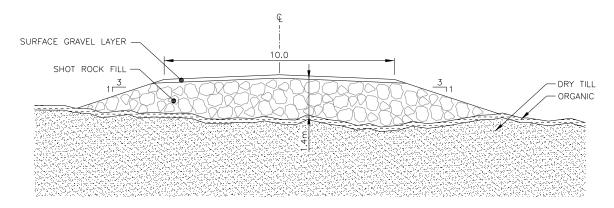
Typical Road Cross Section on Relatively Dry, Stable, Till (Terrain Type 1)
